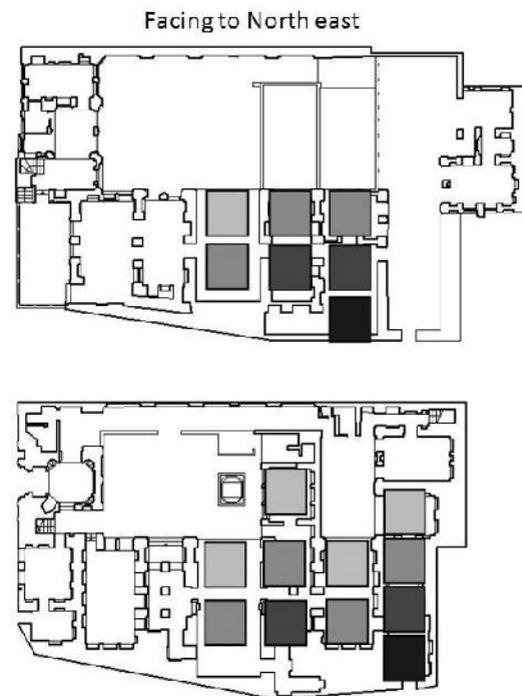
Plan of the ground floor, Ghalmbor house, Dezful
